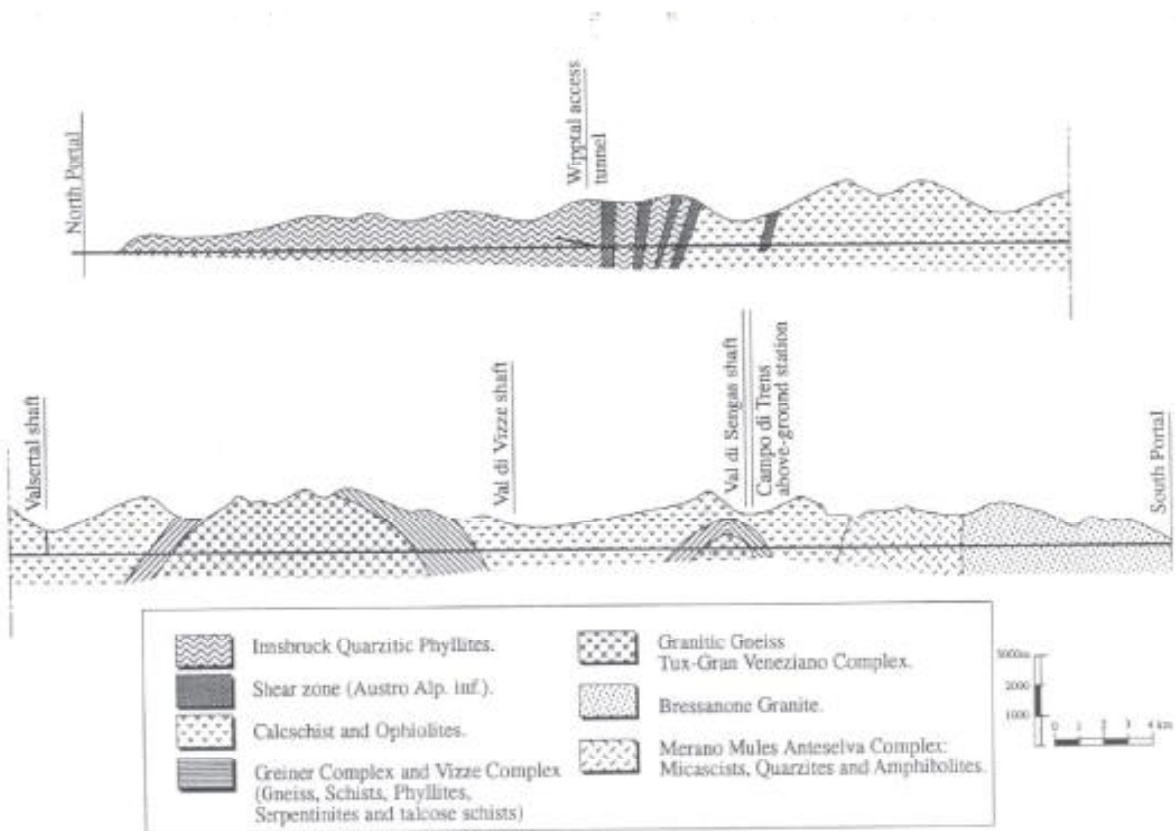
Brennero tunnel - Geological section of the tunnel between Innsbruck and Fortezza
